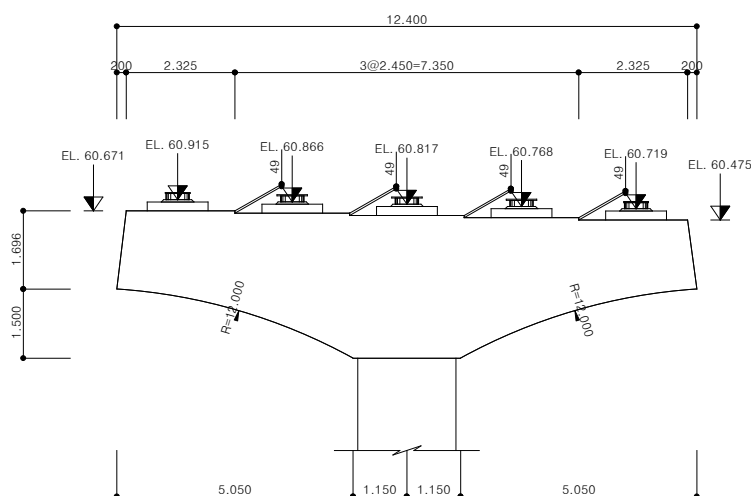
Dimensions and load distribution of pier cap (Bridge number 3)
